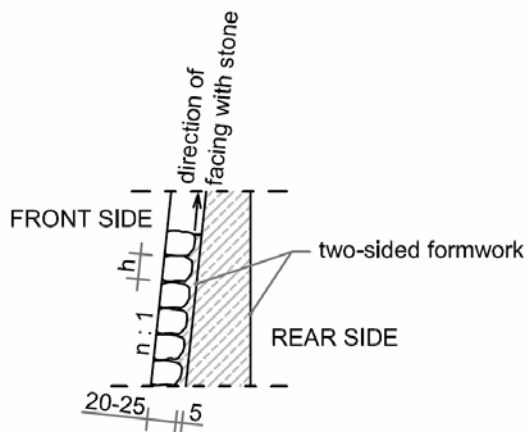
Detail of retaining/supporting wall where the stone facing is carried out subsequently
